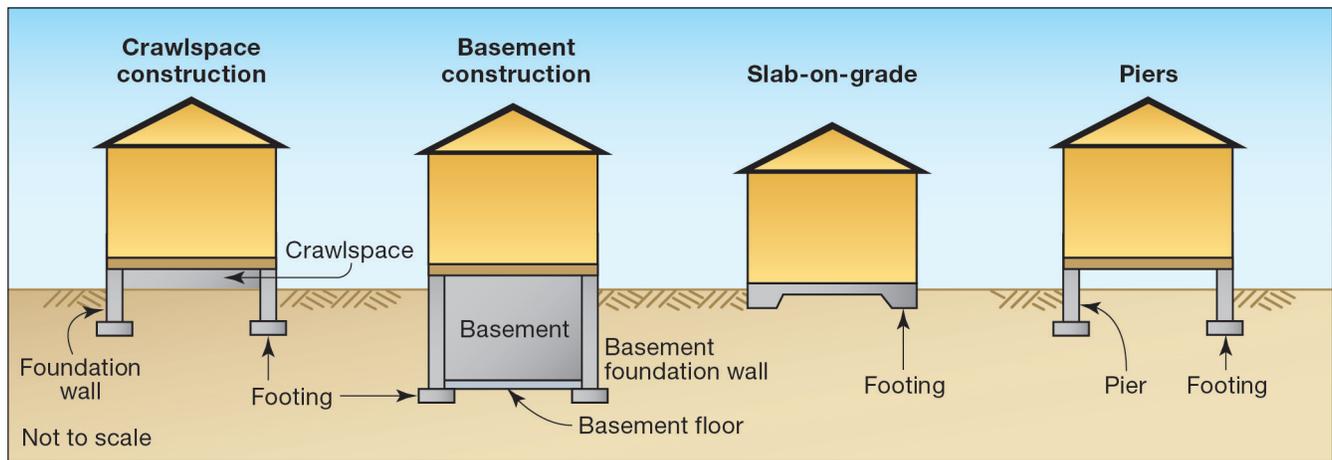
The four foundation types represented in this figure are crawlpace construction, basement construction, slab-on-grade, and piers.
